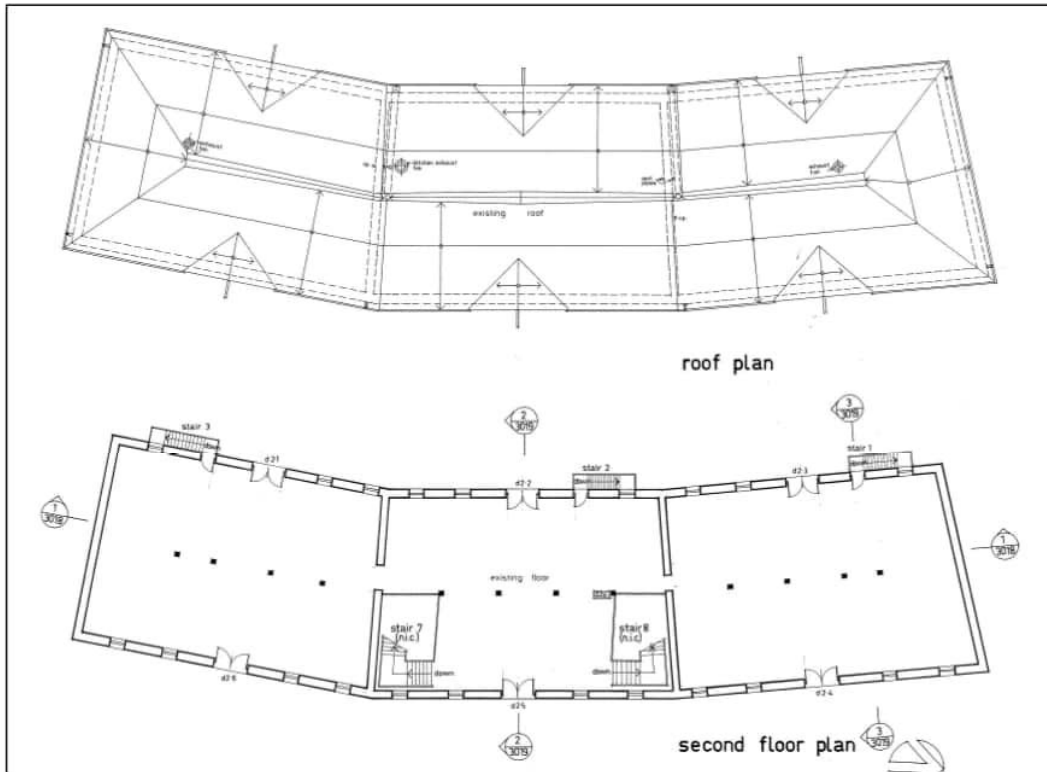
Extract of 1980 plan displaying the second floor and roof plan of the Moore's Wharf building after relocation (Source: Historical plans provided by GroupGSA)
